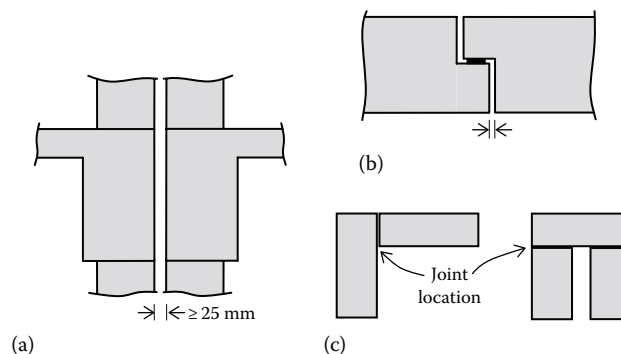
Expansion joint details. (a) Double column and beams. (b) Half joint. (c) Building plans – joint locations.
